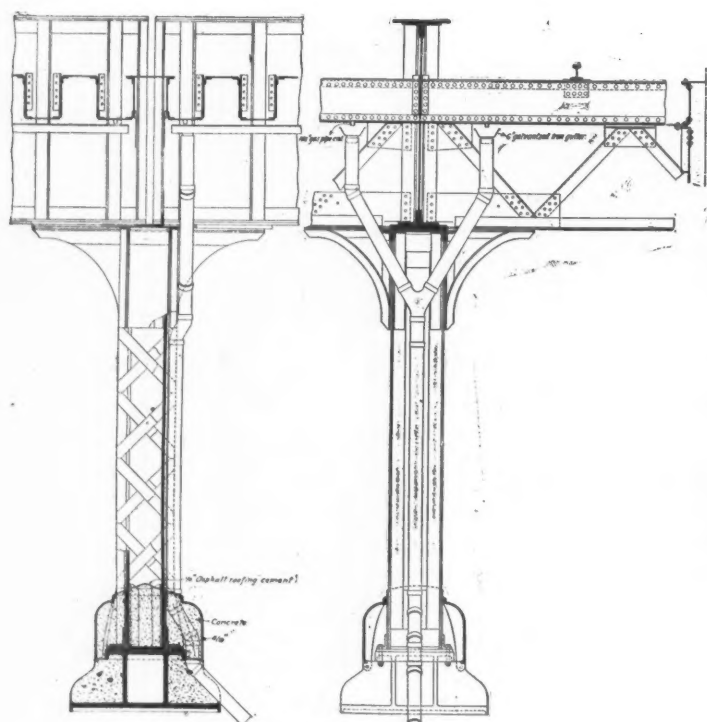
Columns, Showing Drainage Pipes and Wheel Guard.
